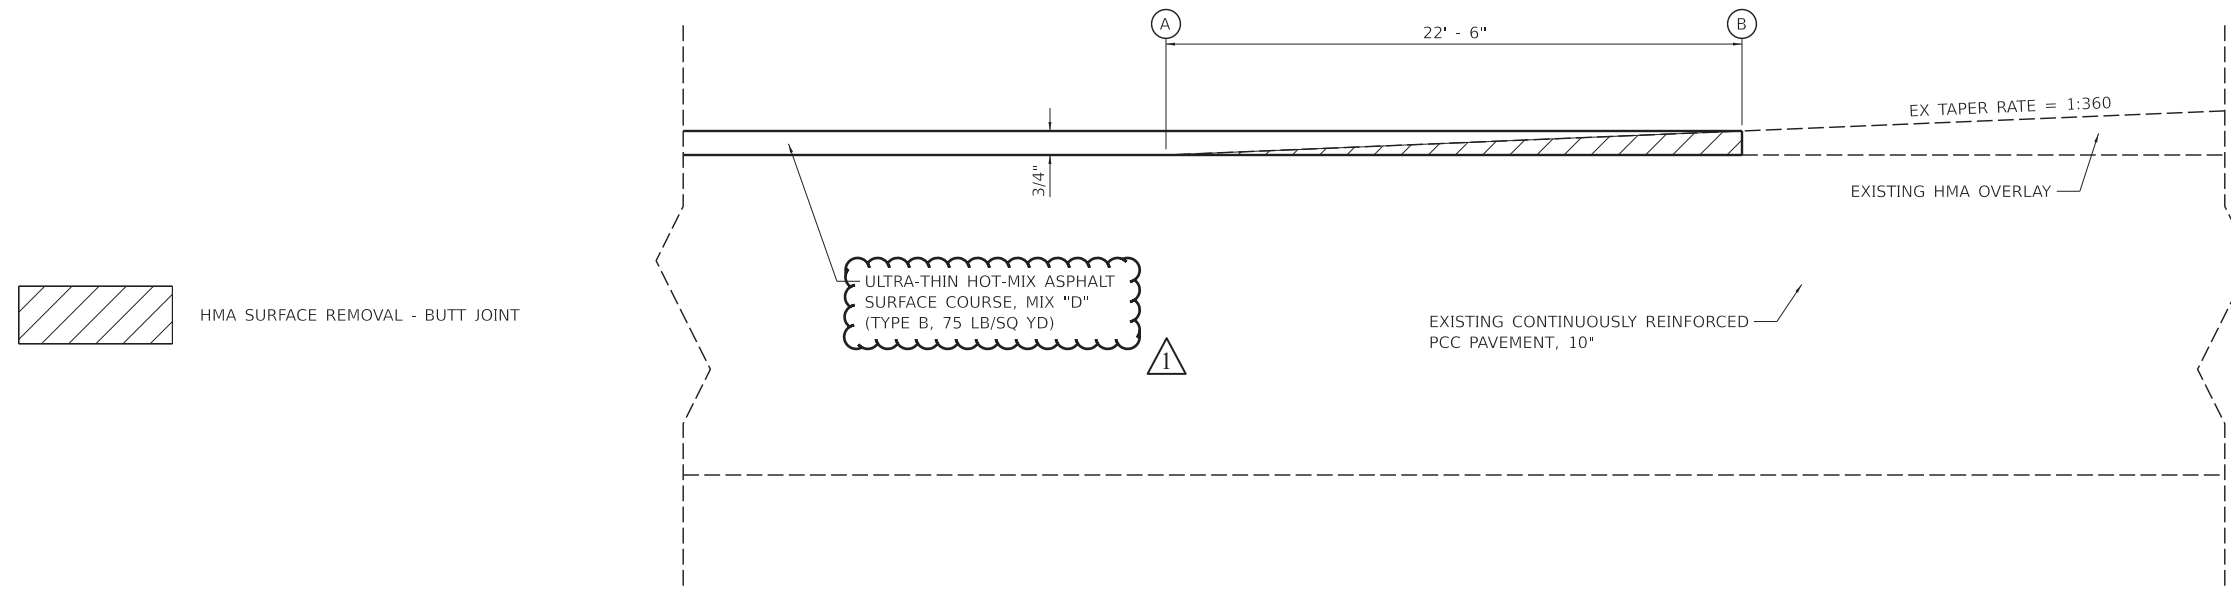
DETAIL FOR PCC SURFACE REMOVAL - BUTT JOINT
